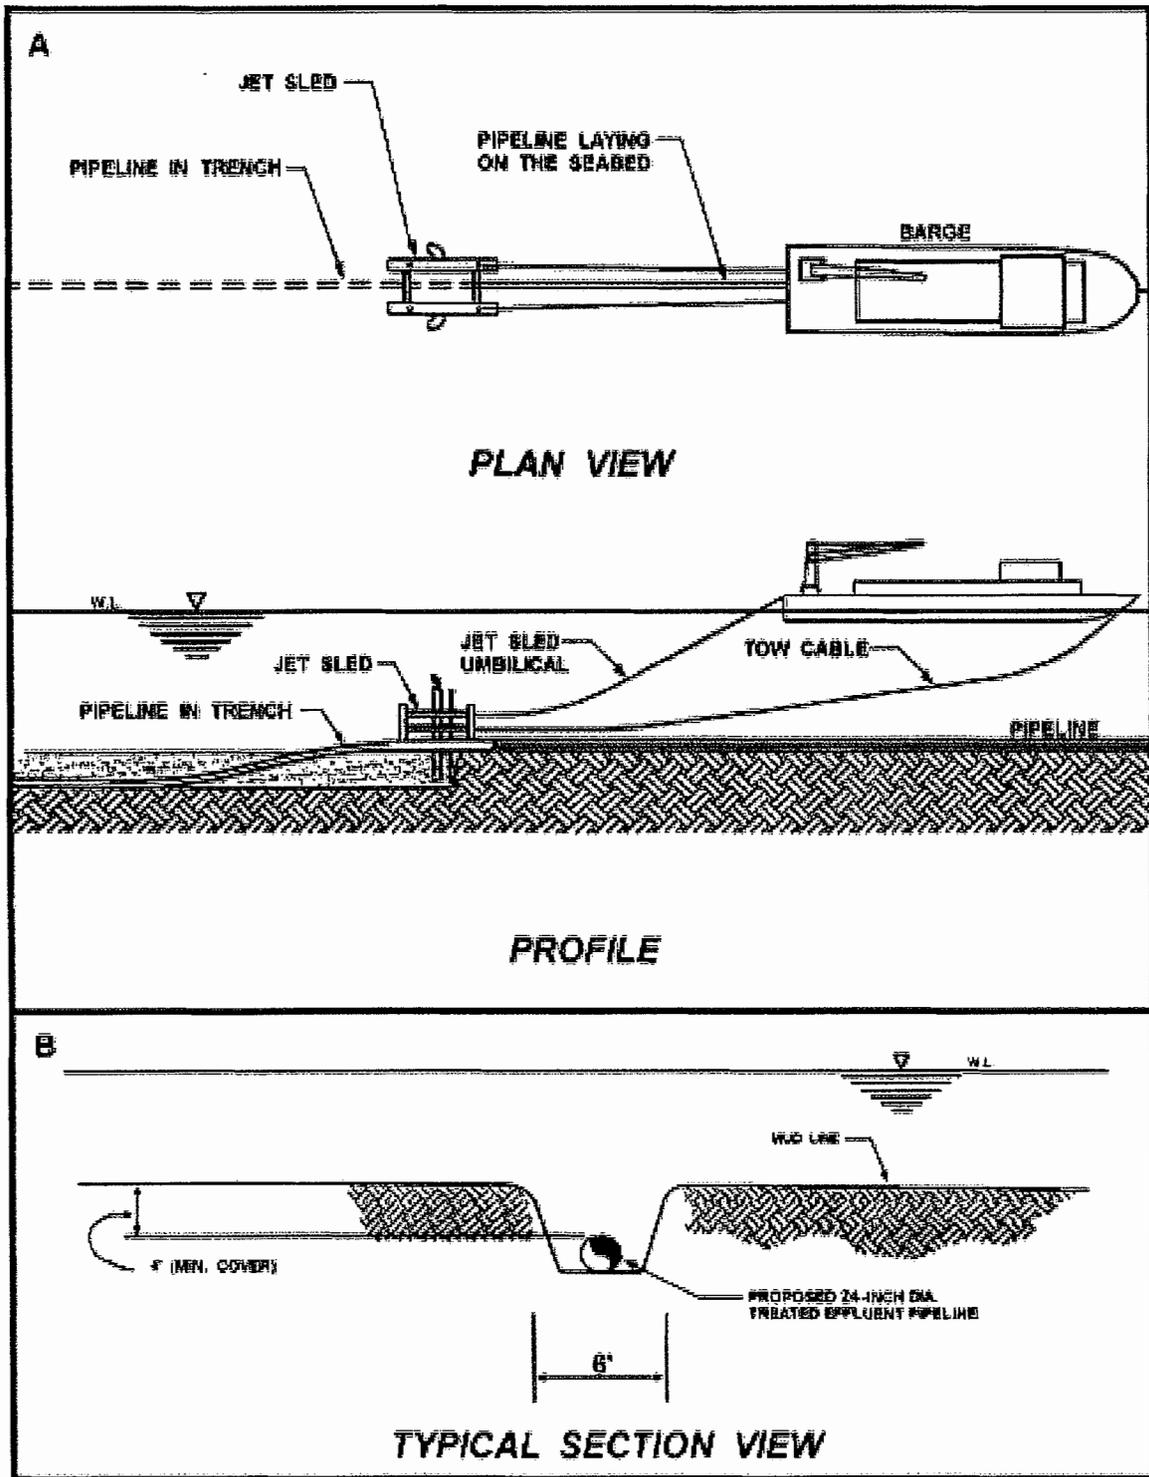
A) Typical pipe-laying barge operation and B) typical trench section configuration.
